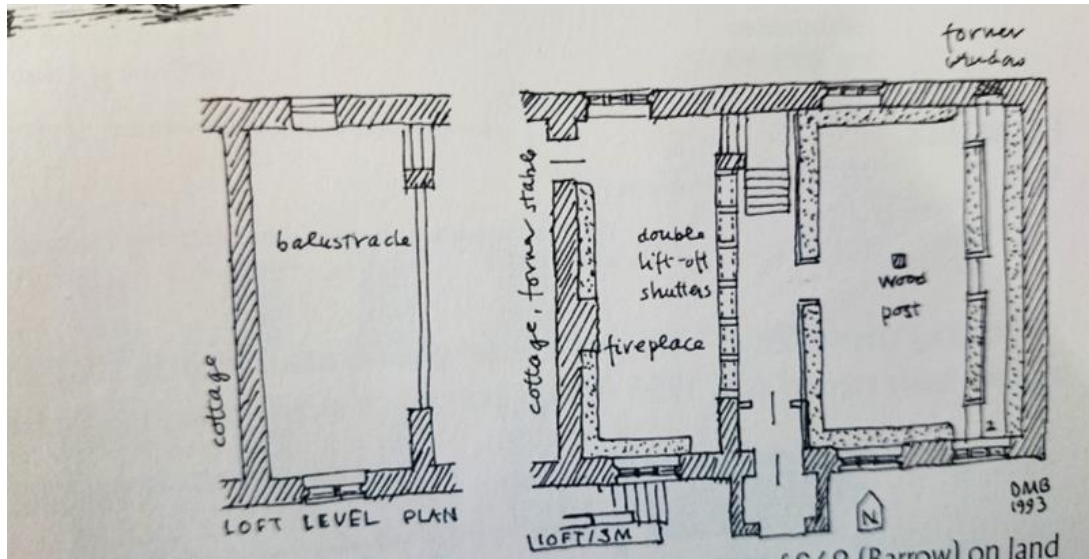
Ground floor plan of the meeting house as reconstructed by Butler (north at the top; not to scale) (Butler (1999), vol. 1, p.303)
